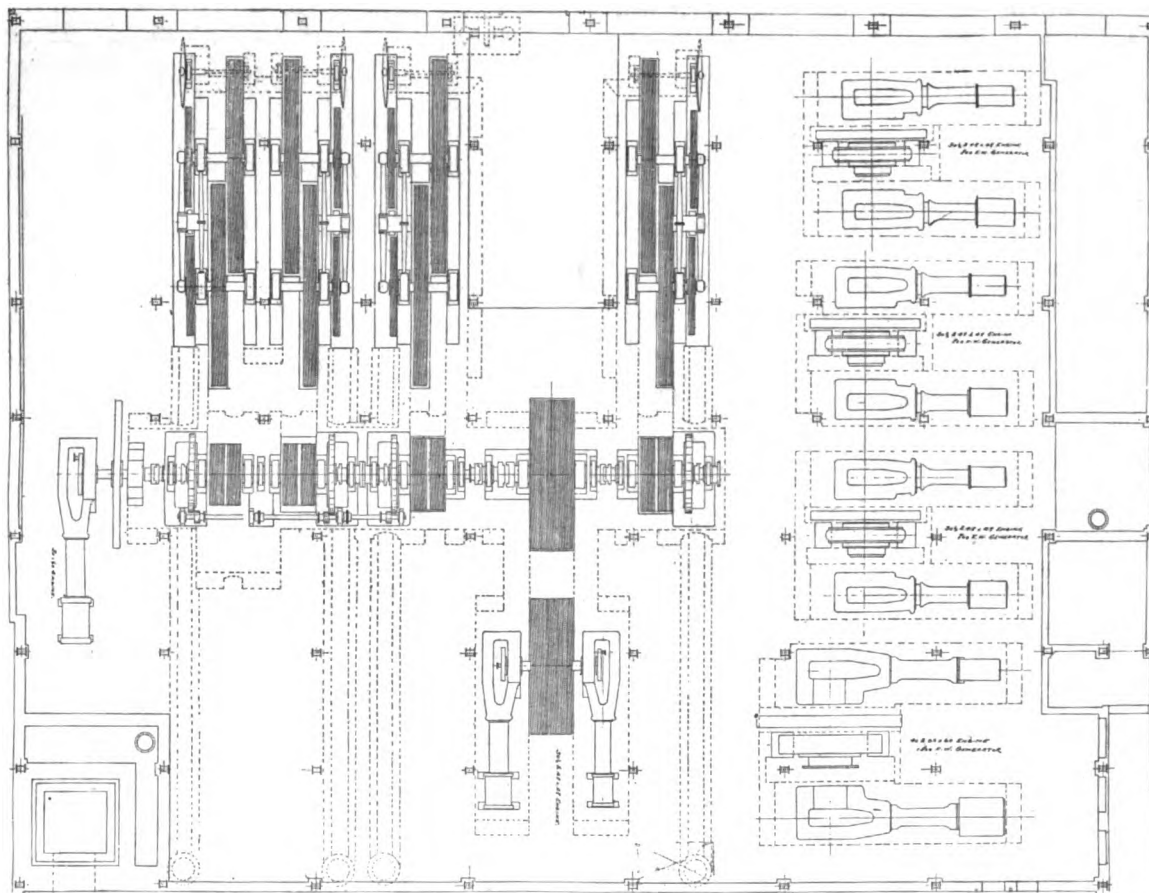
ARRANGEMENT OF GENERATORS IN 25TH STREET RAILWAY POWER HOUSE, NEW YORK.
